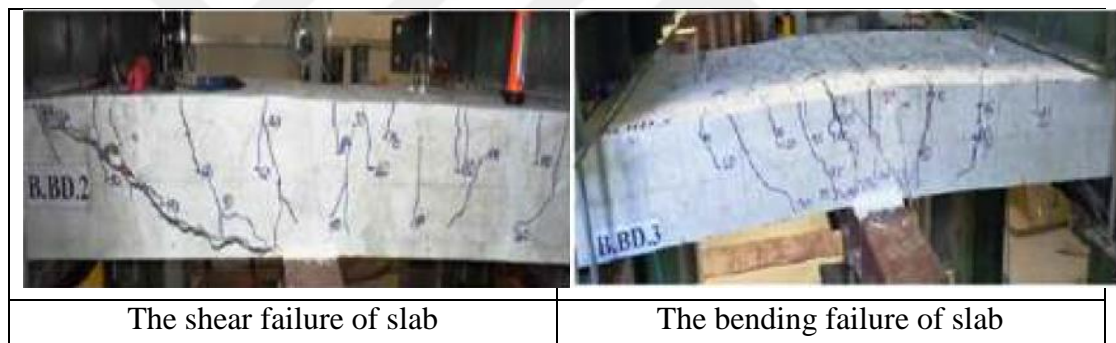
The shear failure and bending failure of slabs (Arati Shetkar and Nagesh Hanche (2015)).
